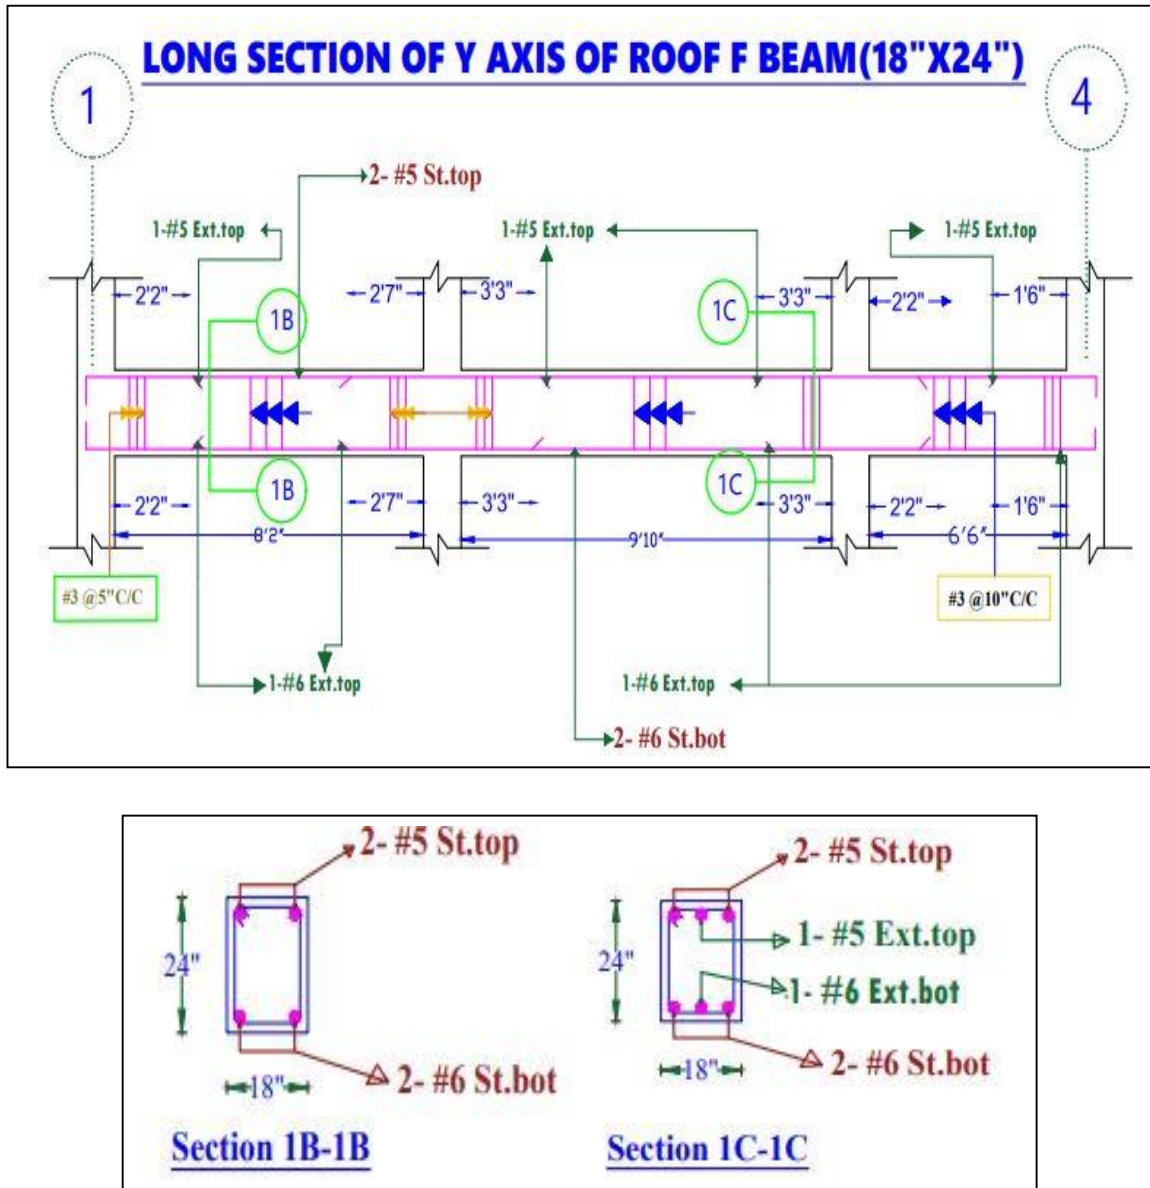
Beam Detailing & Cross Section of Y-axis
